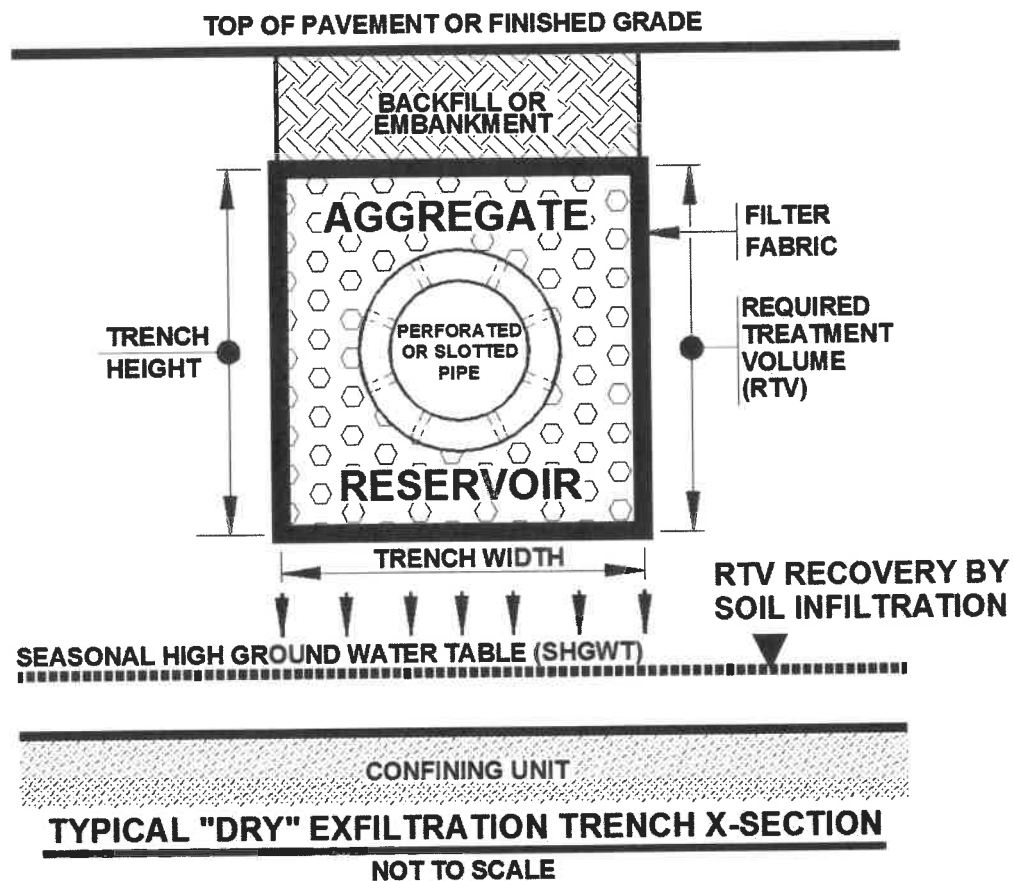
Cross-section of a "DRY" Exfiltration Trench (N.T.S.)
